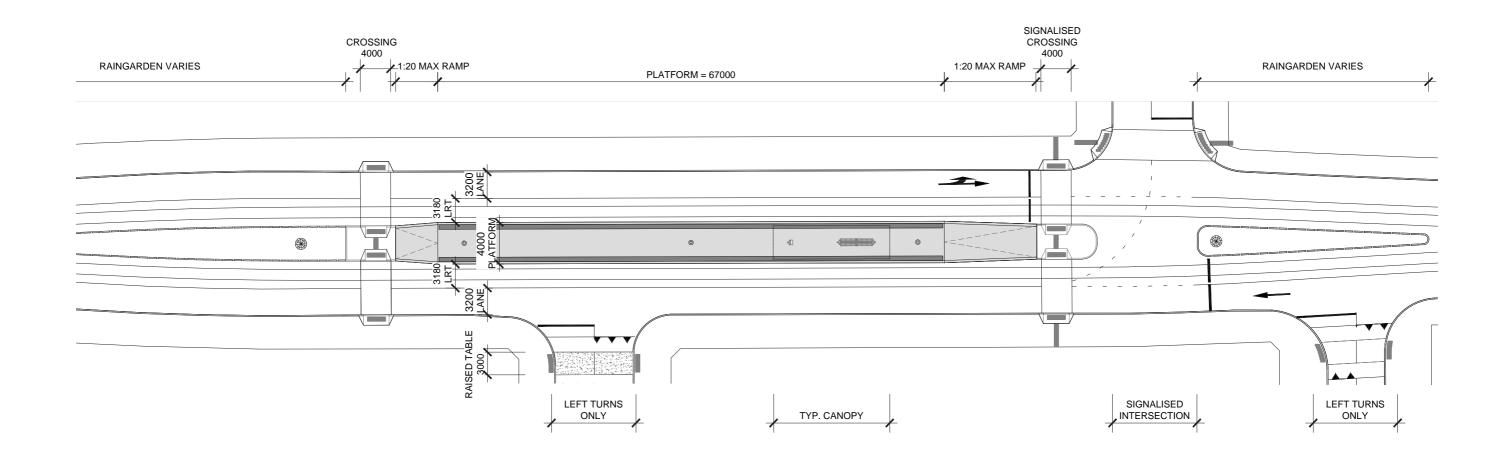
Plan of typical Dominion Road centre stop. Central LRT platform with split carriageway side general traffic lanes x 1 in each direction (reduced from 4 general traffic lanes).
